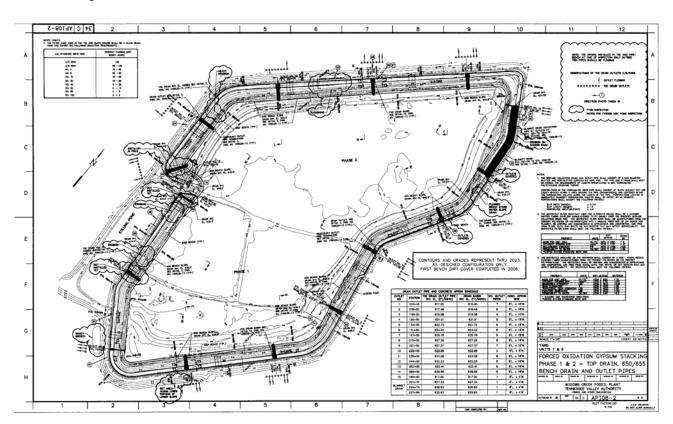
Toe Drain, 650/655 Bench Drain and Outlet Pipe
